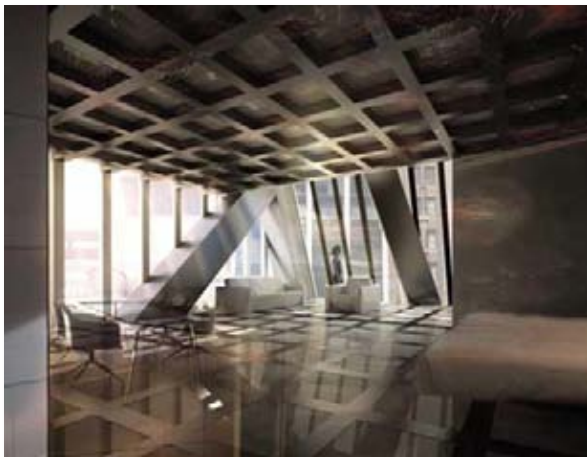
(ABOVE): HOTEL ROOM IN TOWER VERRE
